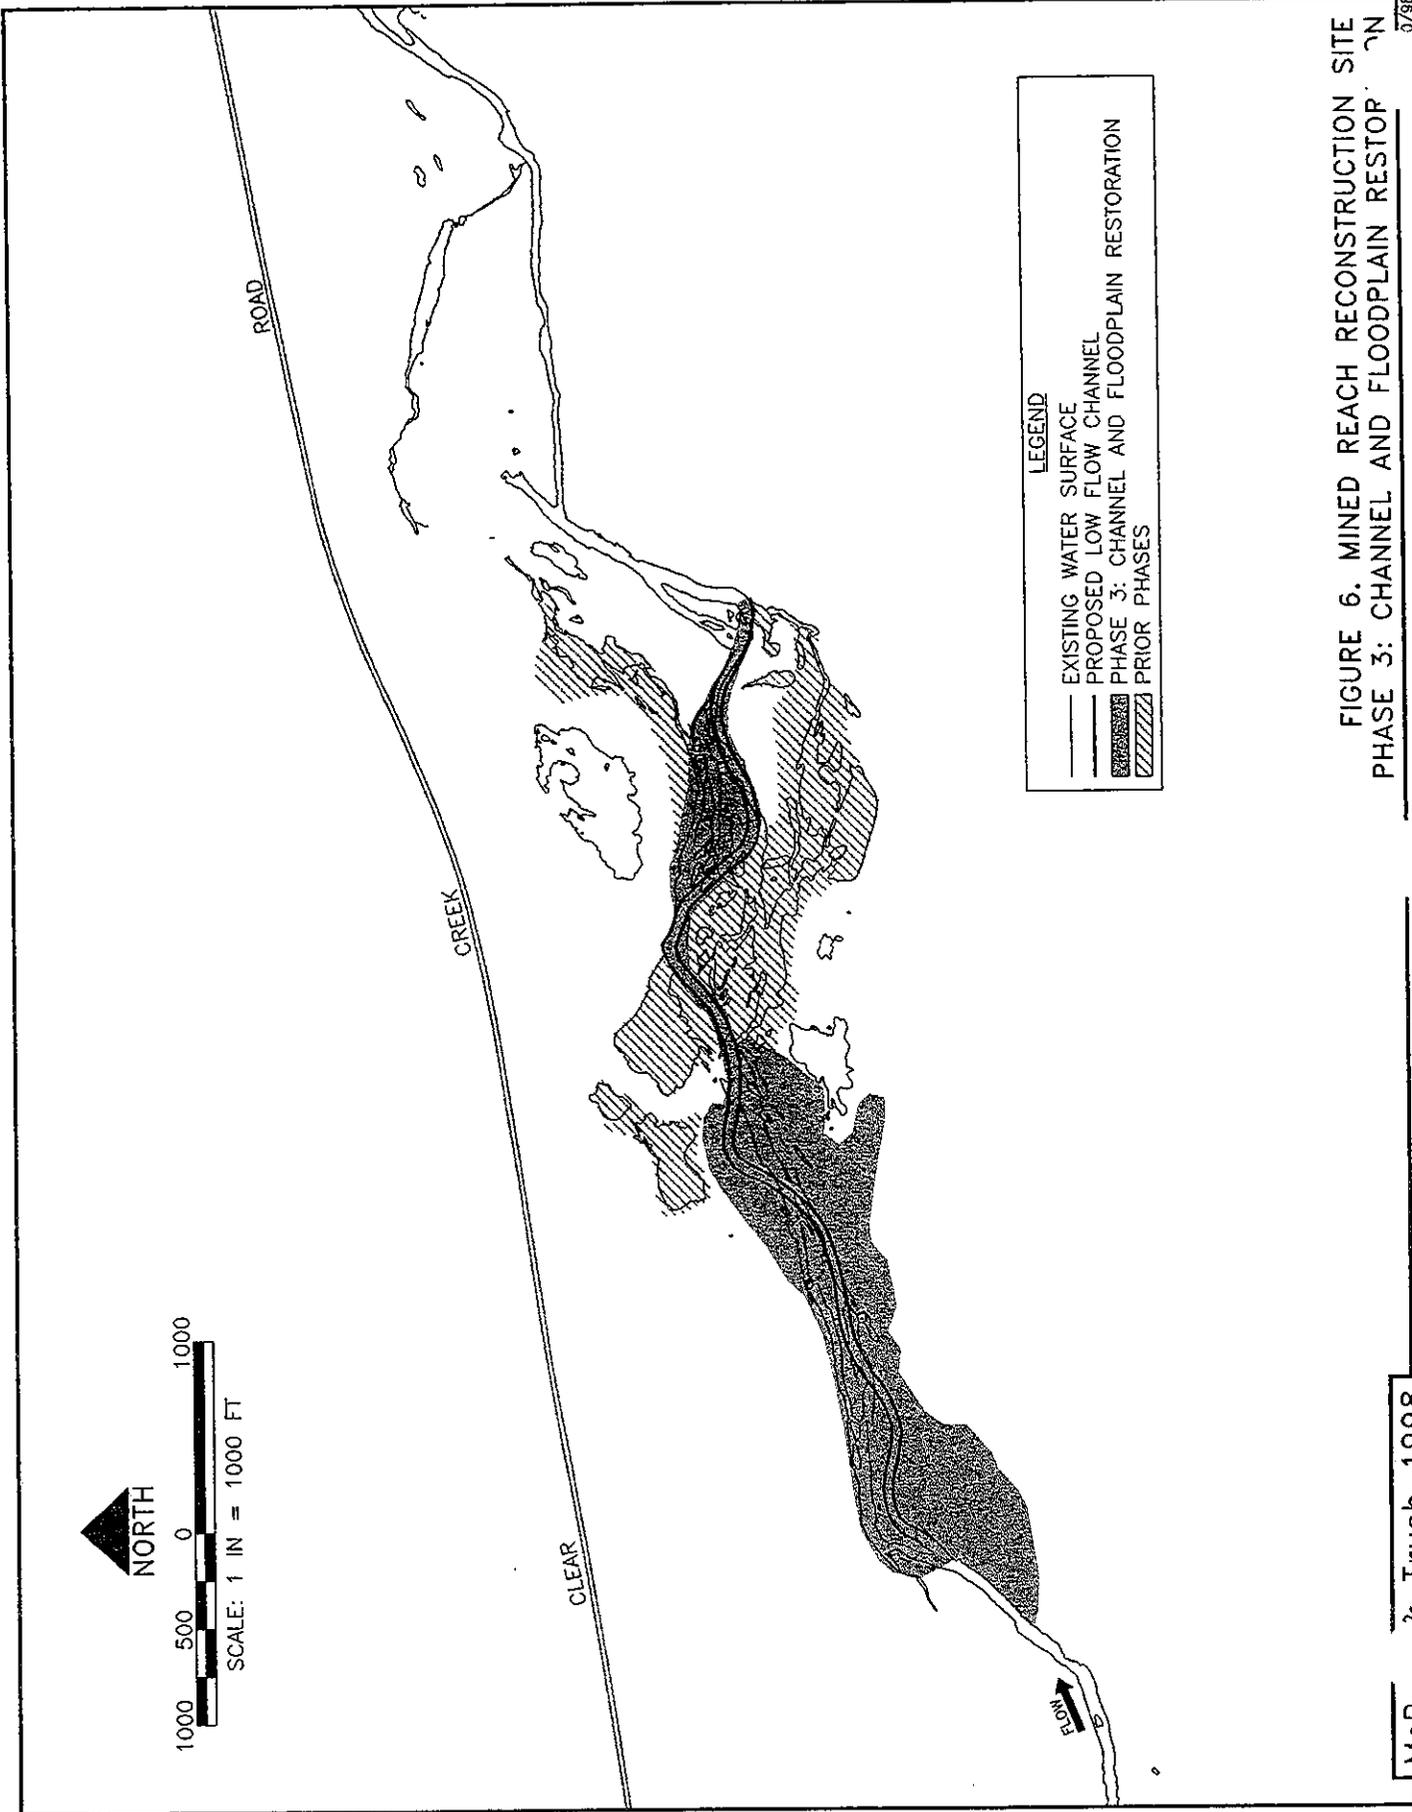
MINED REACH RECONSTRUCTION SITE
